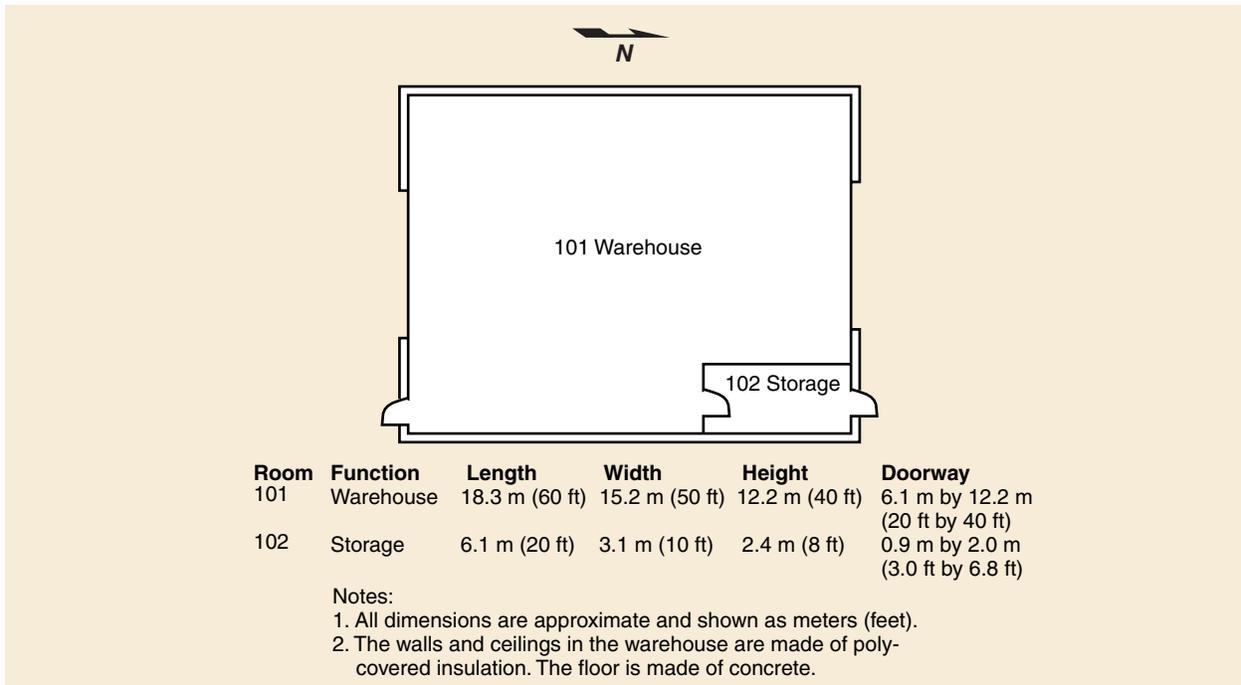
Building 6 Detailed Floor Plan, Astrotech
